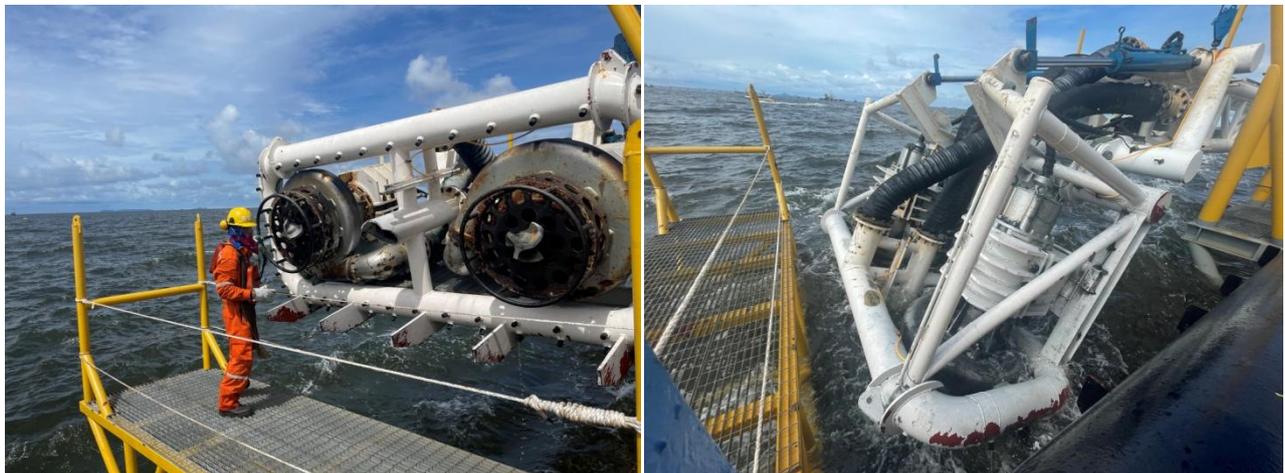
Pre-trenching Trailing Arm with Submersible Dredge Pump Components (Bottom section)
